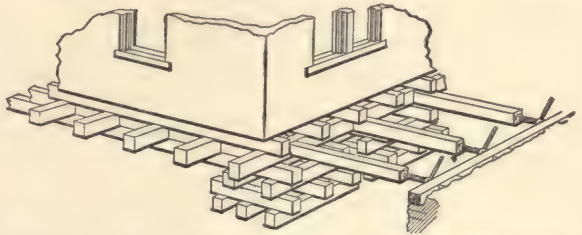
Manner of Placing Blocking and Horizontal Screws.
